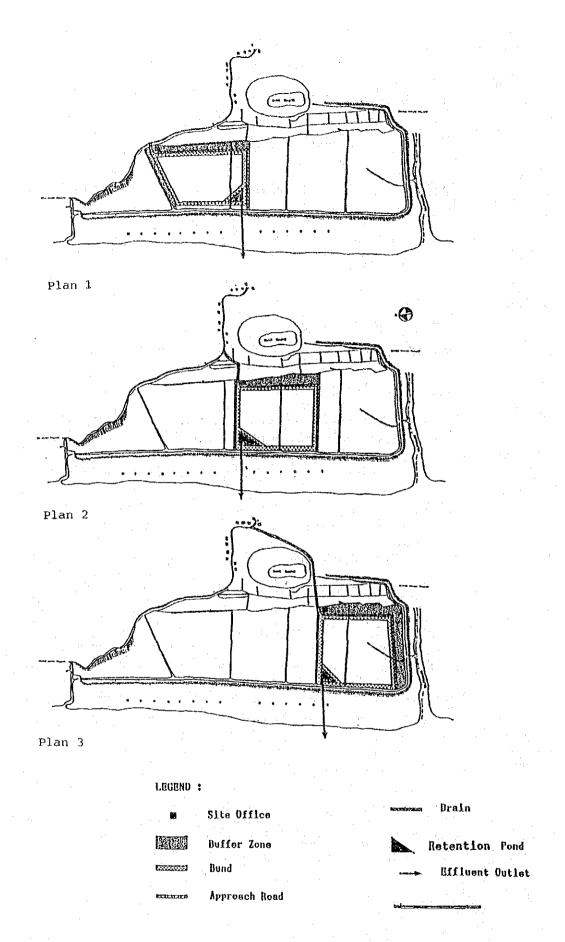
Concept Plan for First Phase Project of PADS
